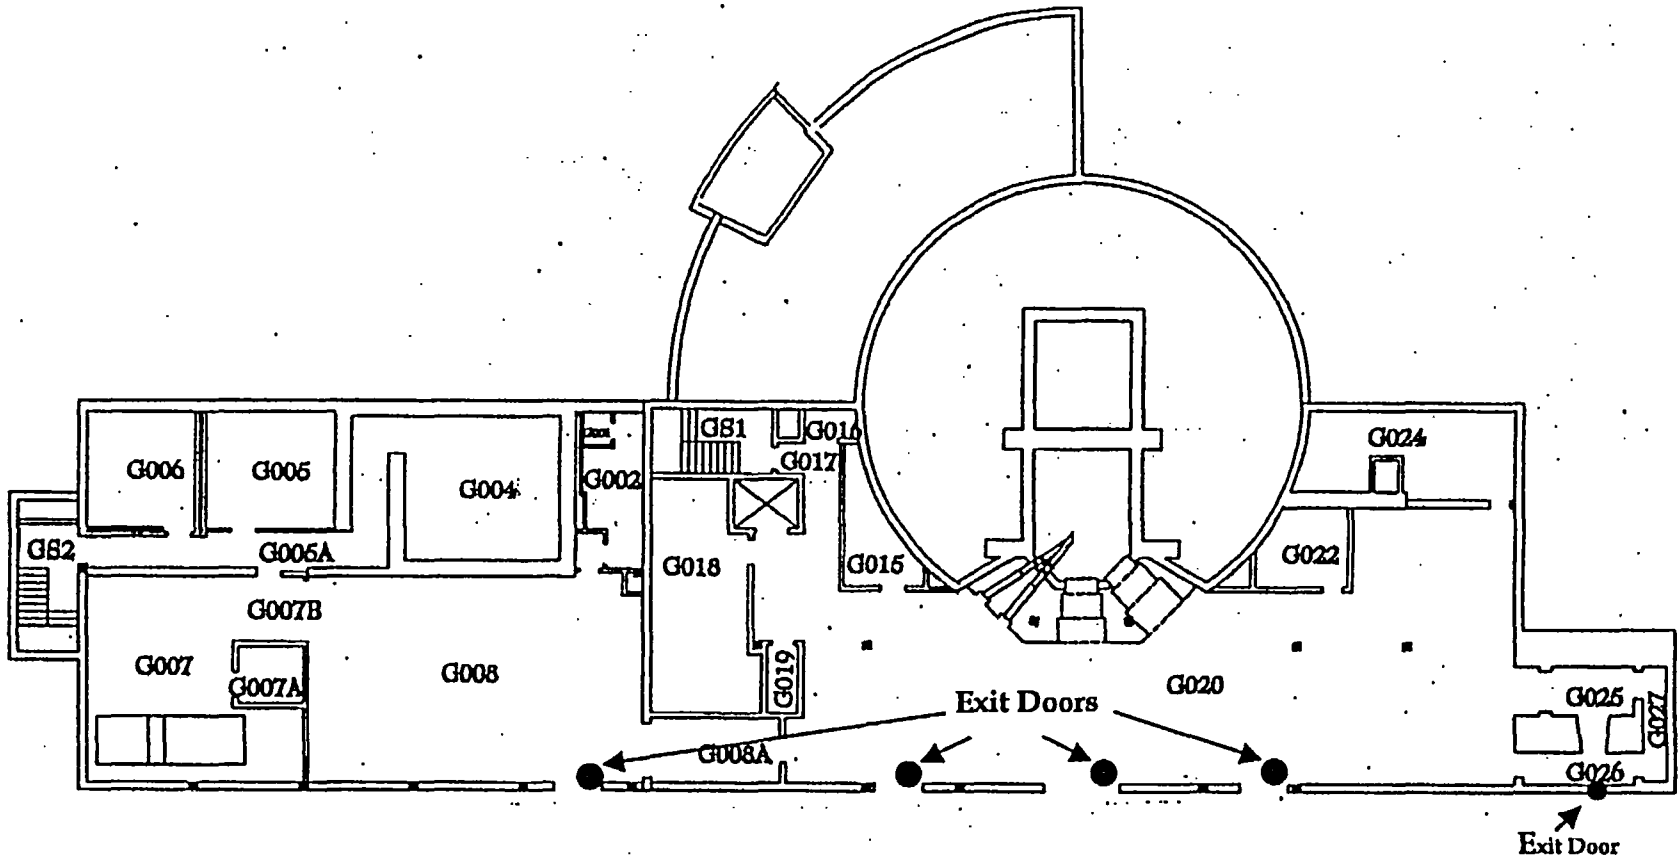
UVA Reactor Ground Floor Plan View Indicating Survey Locations on Exterior Building Surfaces.
